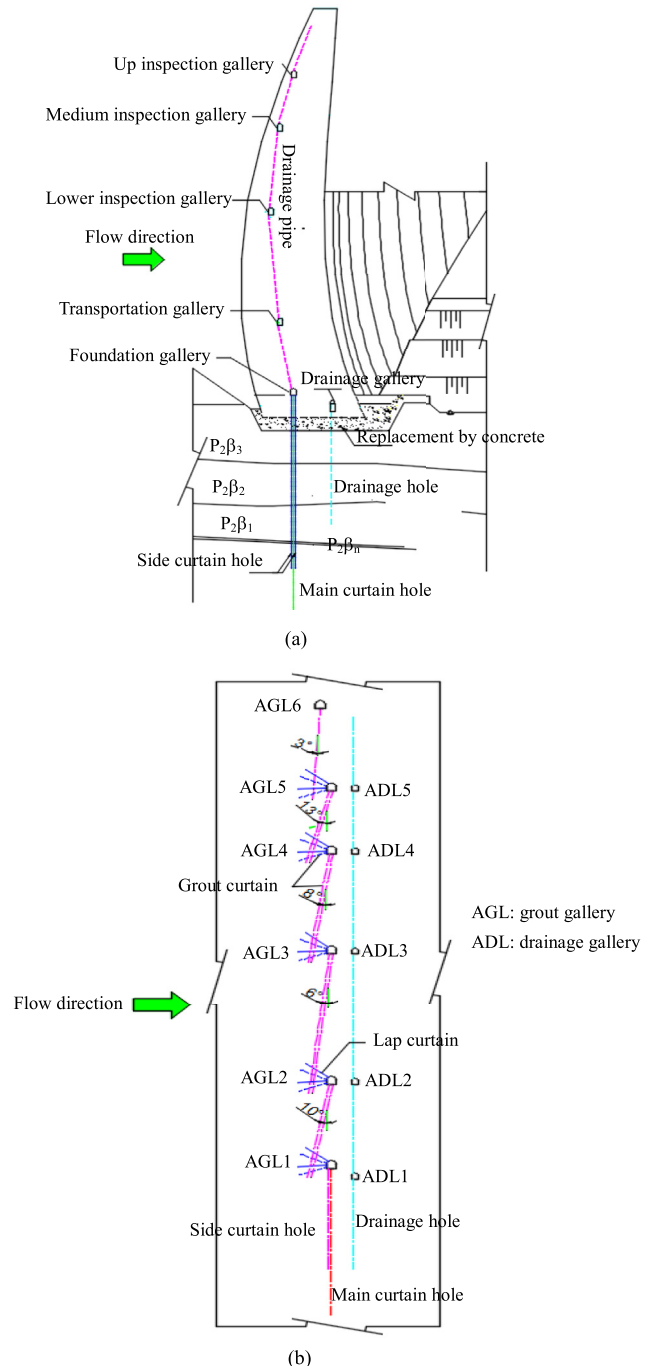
Arch dam foundation curtain grouting and drainage arrangement system. (a) Anti-seepage curtain of dam foundation. (b) Anti-seepage curtain wall.
